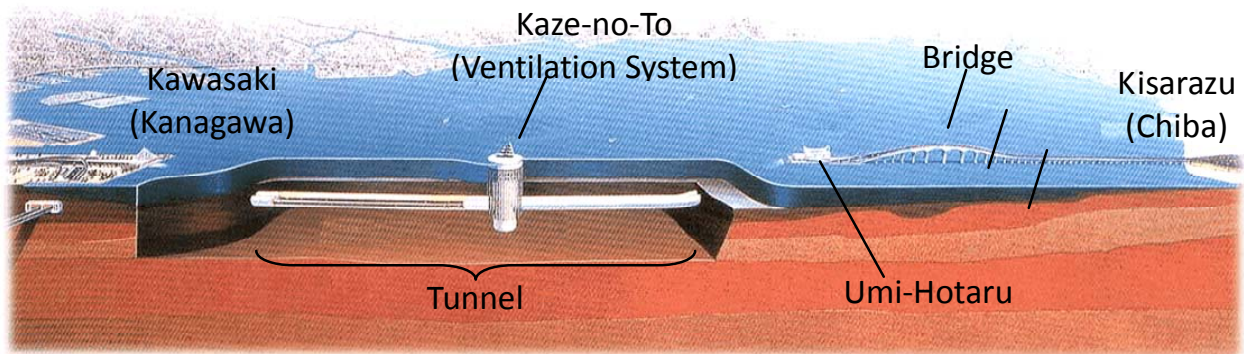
Outline Drawing of the Tokyo Bay Aqua-Line
